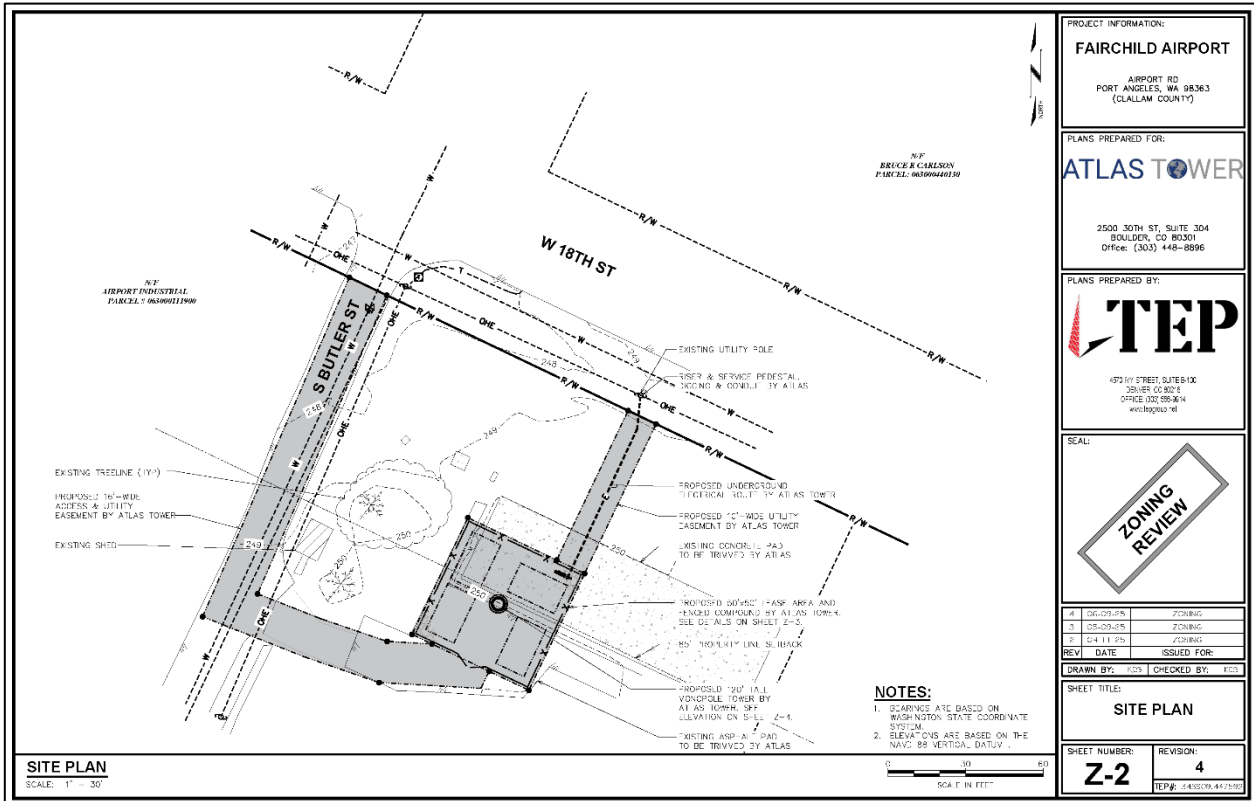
Site plan for proposed tower. For the full preliminary plan set see Exhibit 2.
